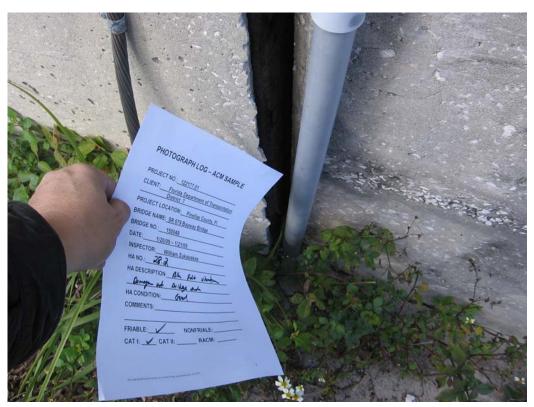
01/21/09 – SAMPLE 28.2 – HA 28 BLACK VIBRATION DAMPERS AT NORTH AND SOUTH BRIDGE ENDS
